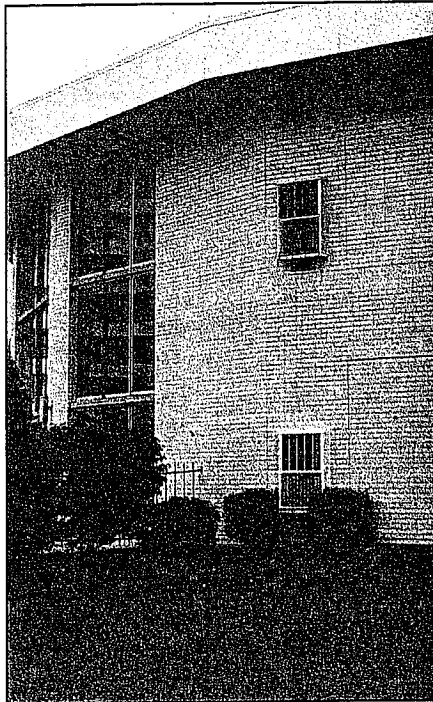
Mounting through the wall up to the Magic-Pak mounting flange inside permits minimum intrusion into interior occupied space of 13-7/16 in.
